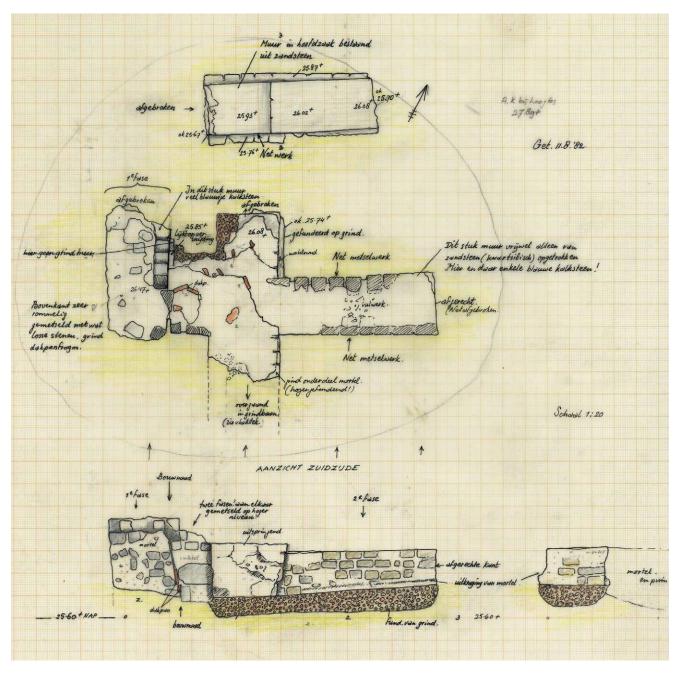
Cross section and surface drawing of the wall on the boundary between rooms 11 and 13
